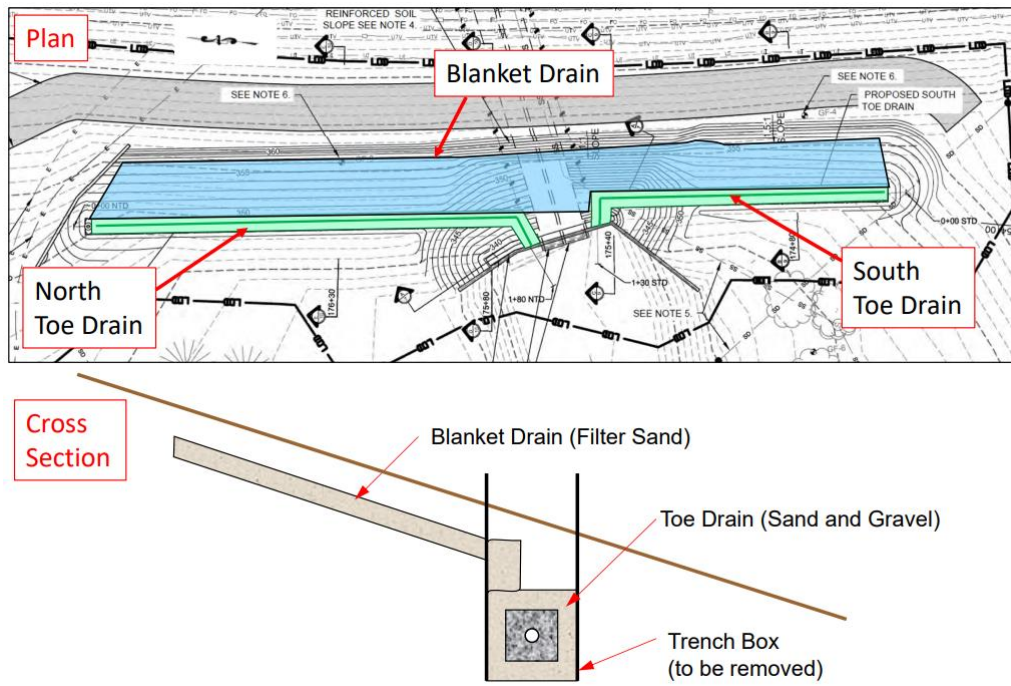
Lake Whetstone Blanket Drain plan view and cross section
